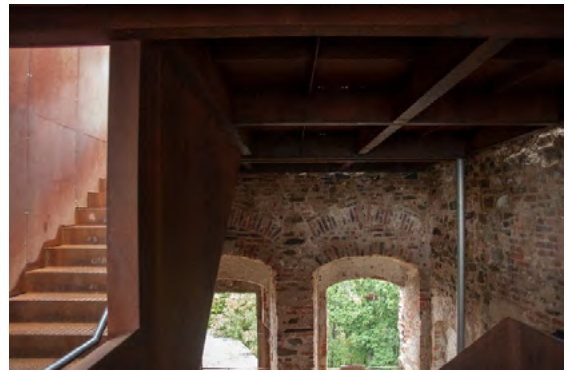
Corten footbridge on the second level of the palace, glass room roofing and roof drainage, 2022, by K. Drobek
